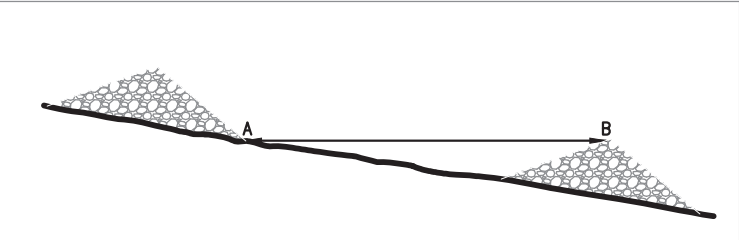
C. Space check dams in the channel so the up-stream dam toe elevation (A) and down-stream dam toe elevation (B) are the same.
